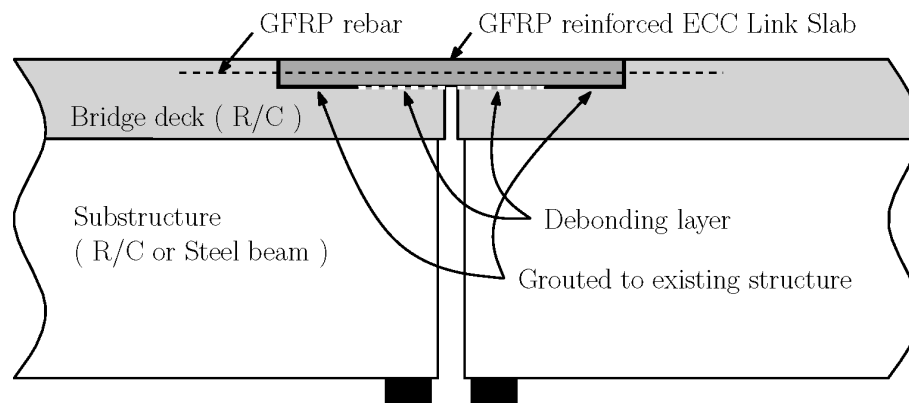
Proposed GFRP reinforced ECC link slab concept.
